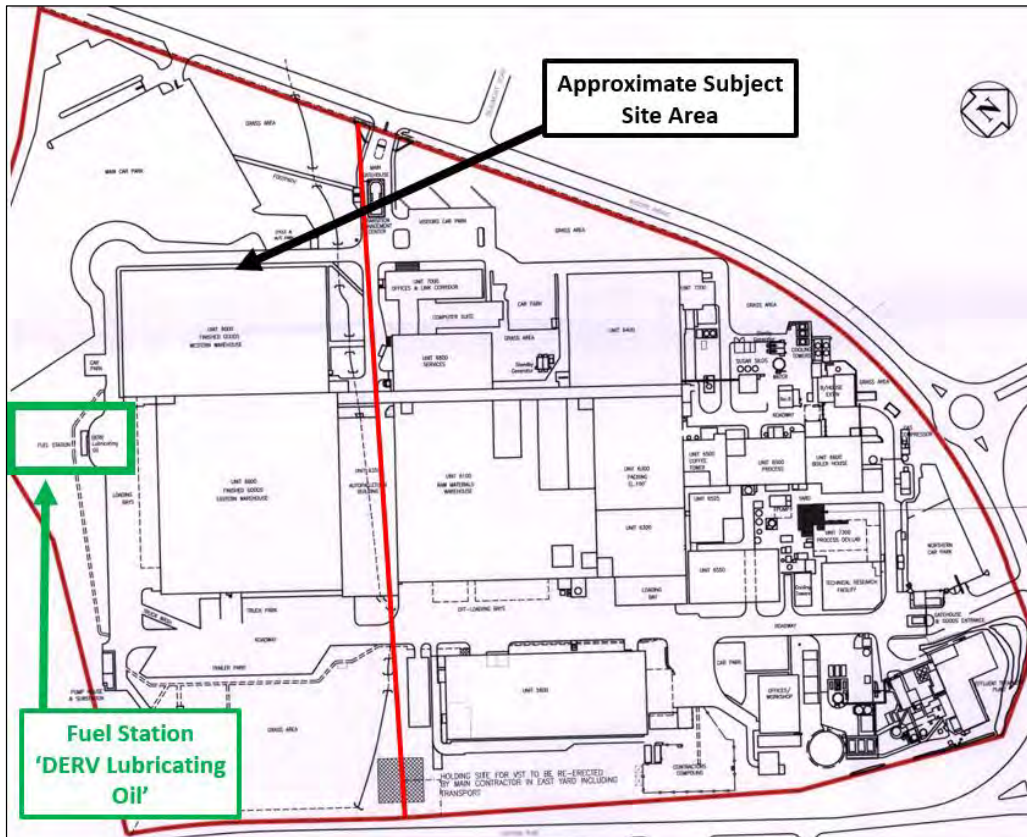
Former Subject (and adjacent larger Kraft) Site Layout
